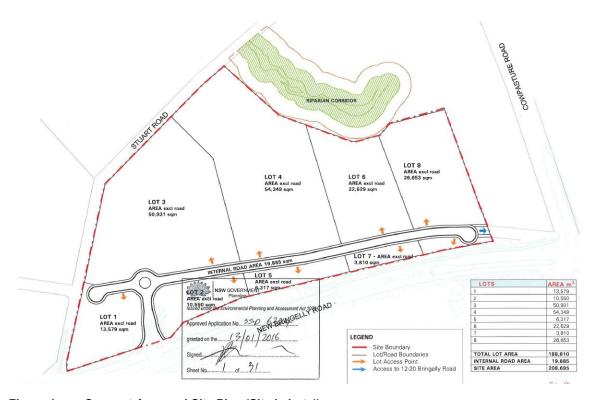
Concept Approval Site Plan (Site is Lot 4)
